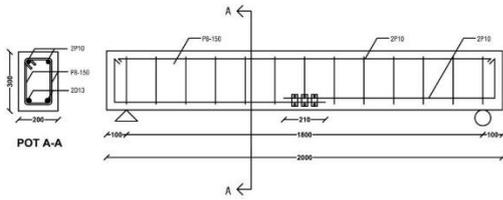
Detail reinforcement of RC beam with mechanical splice (MSC)
